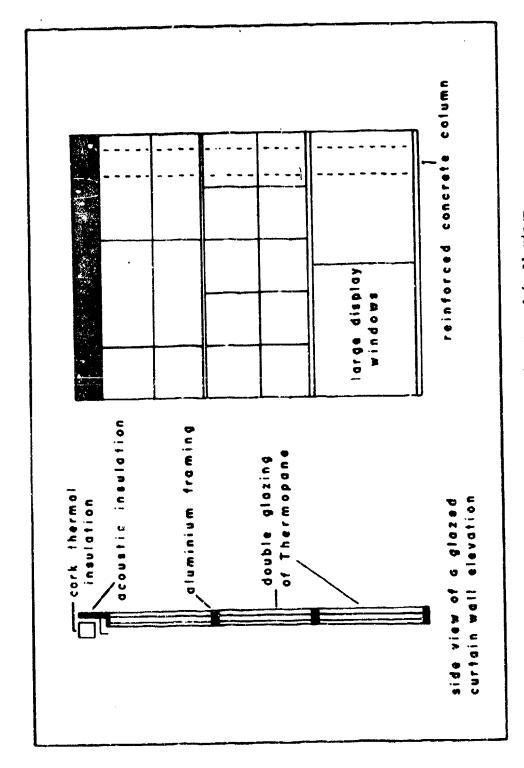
Frample of a Concrete/Steel-Framed Building with Light-Cladded Curtain Walls
